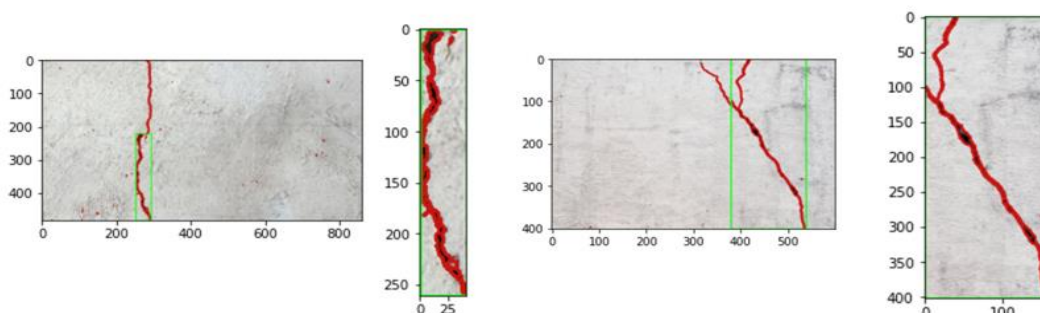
Crack detail and dimensioning (by author, 2022)
